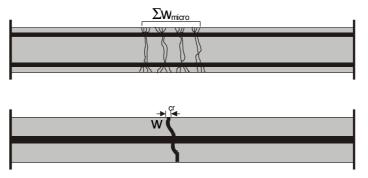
Cracking in specimens with 4 rebars and 1 rebar (longitudinal and cross section)
